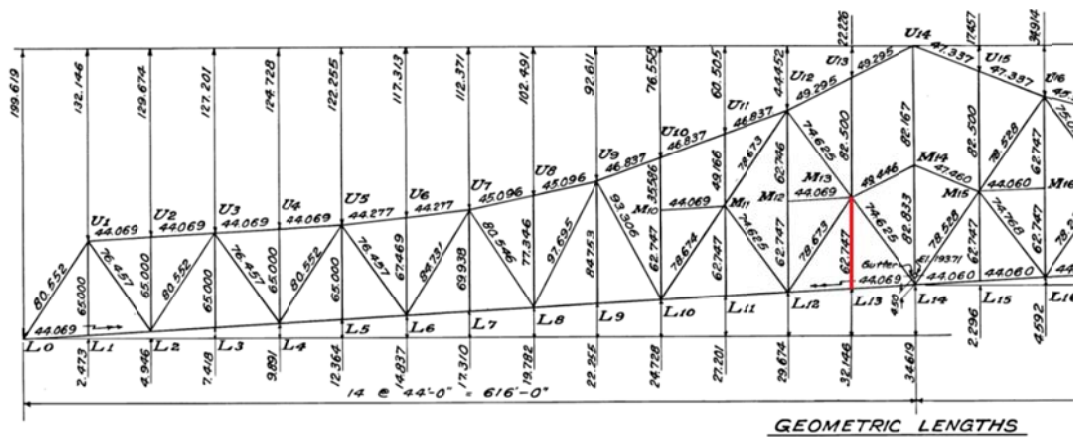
Length (in feet) and positions of truss bridge members. Vertical L13-M13 is highlighted in red.
